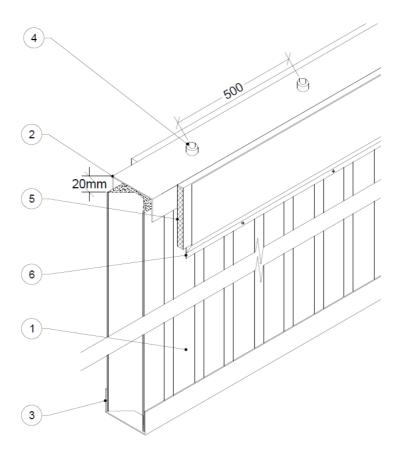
Head Detail A- Protected Each Side with 13mm thick Fire Grade Plasterboard
